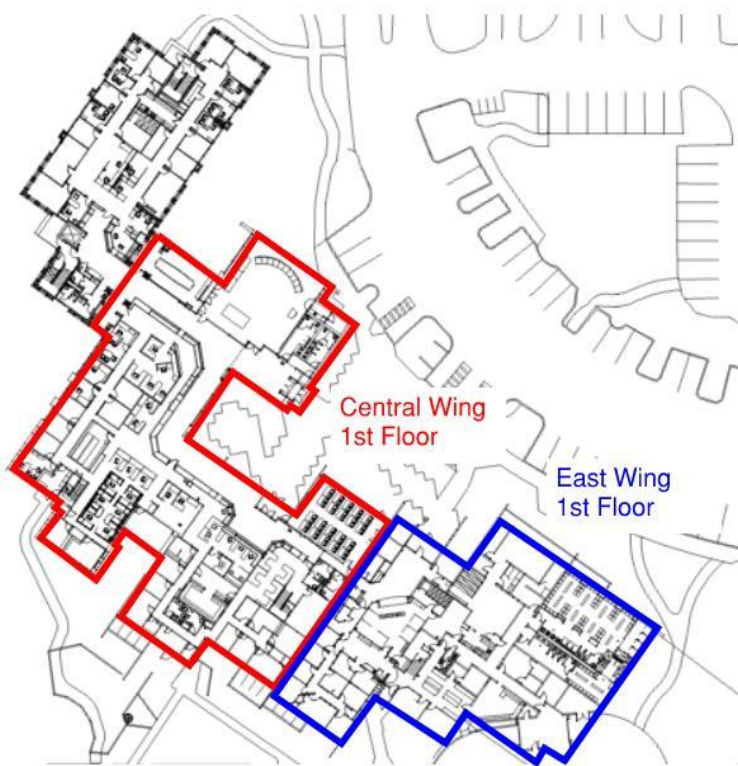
Existing layout and footprints of Central and East Wing first and second floors
